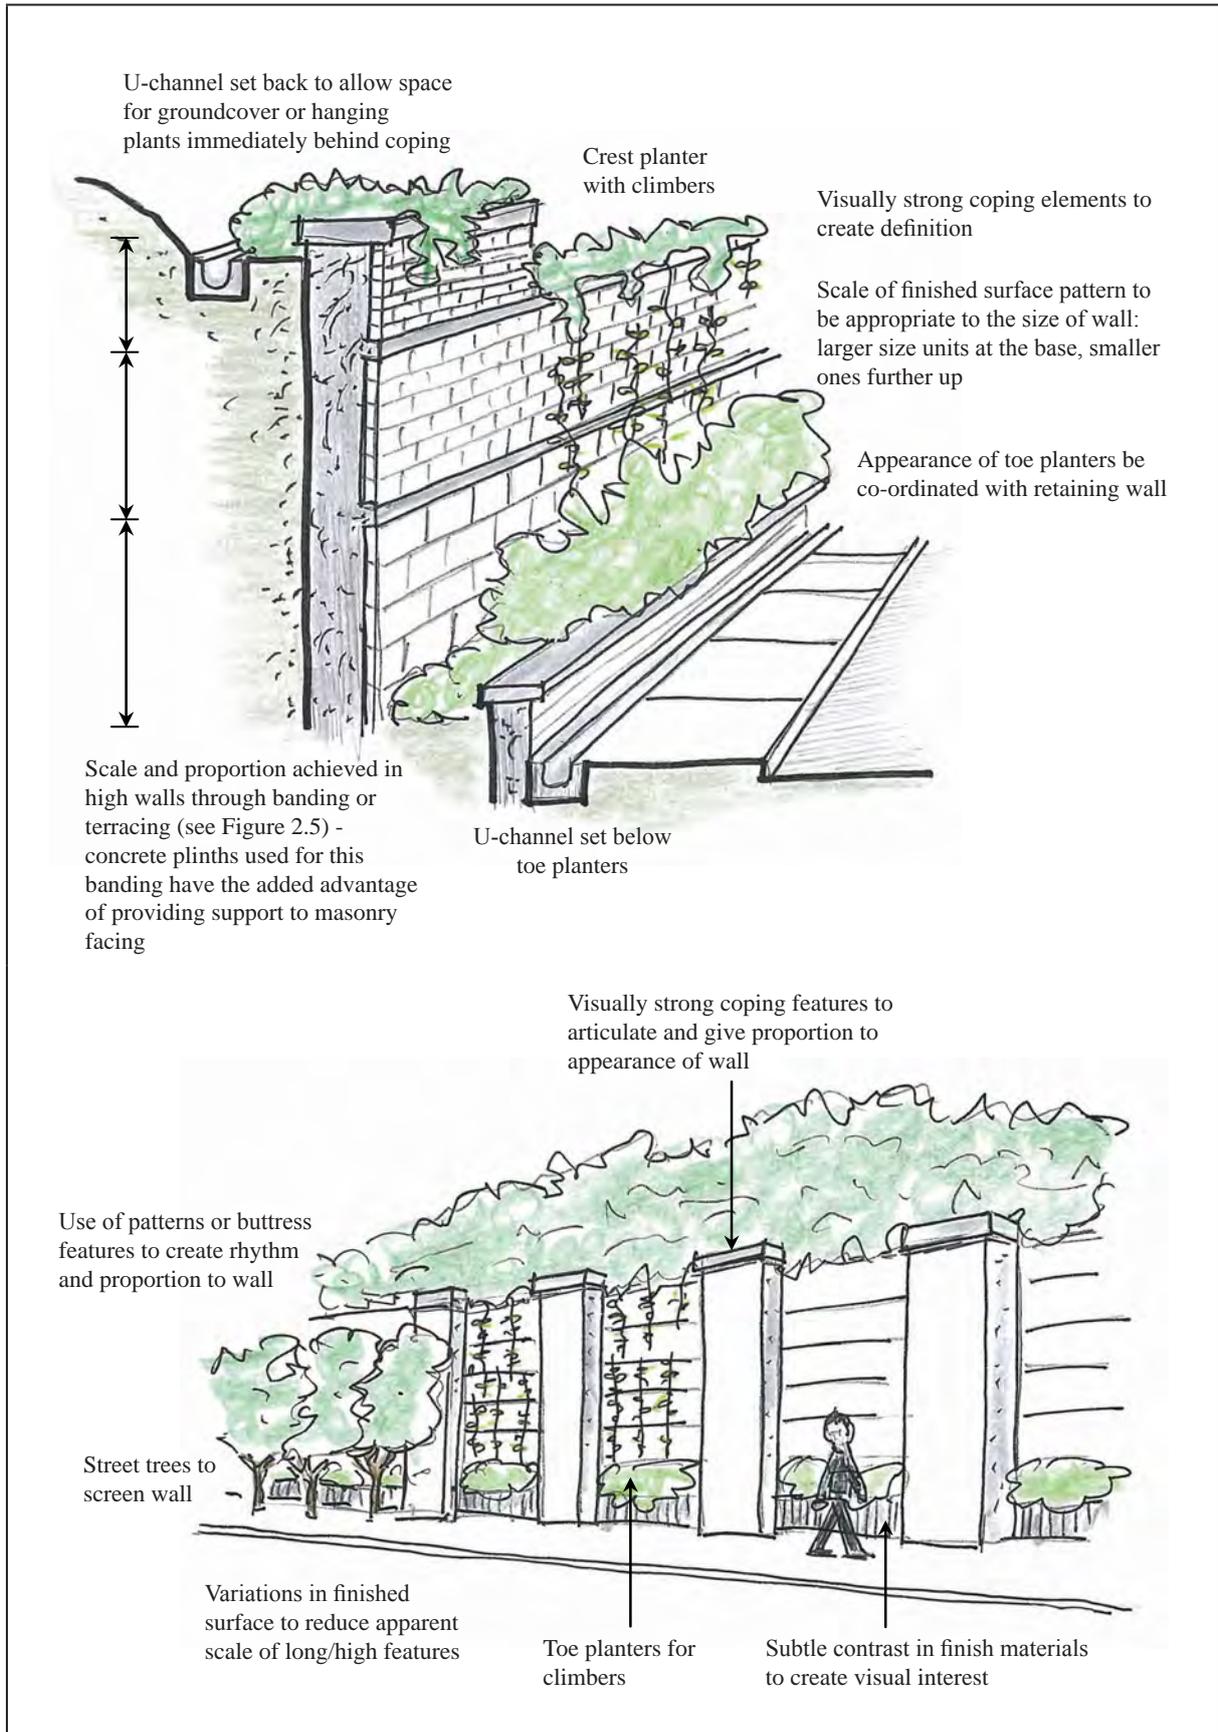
Visual Treatment of Concrete Retaining Walls
